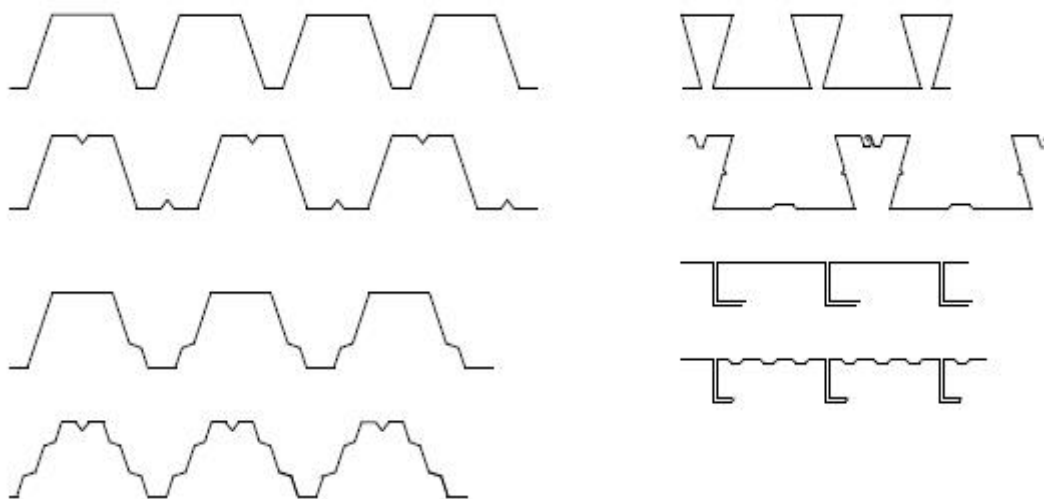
Trapezoidal Profiled Sheets and Liner Trays
